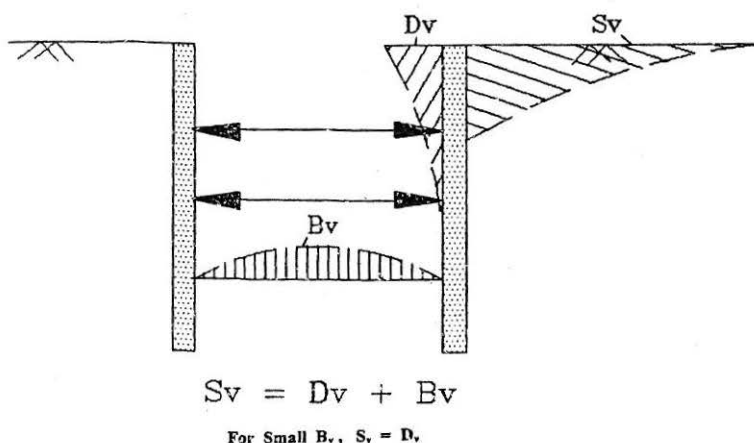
Volume of Lost Ground and Wall Deflection
